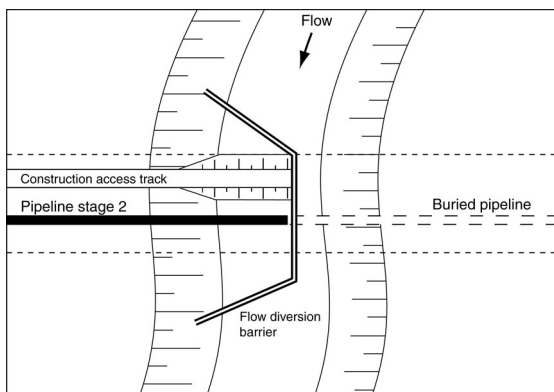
Stage 2 of pipe installation using an isolation barrier
